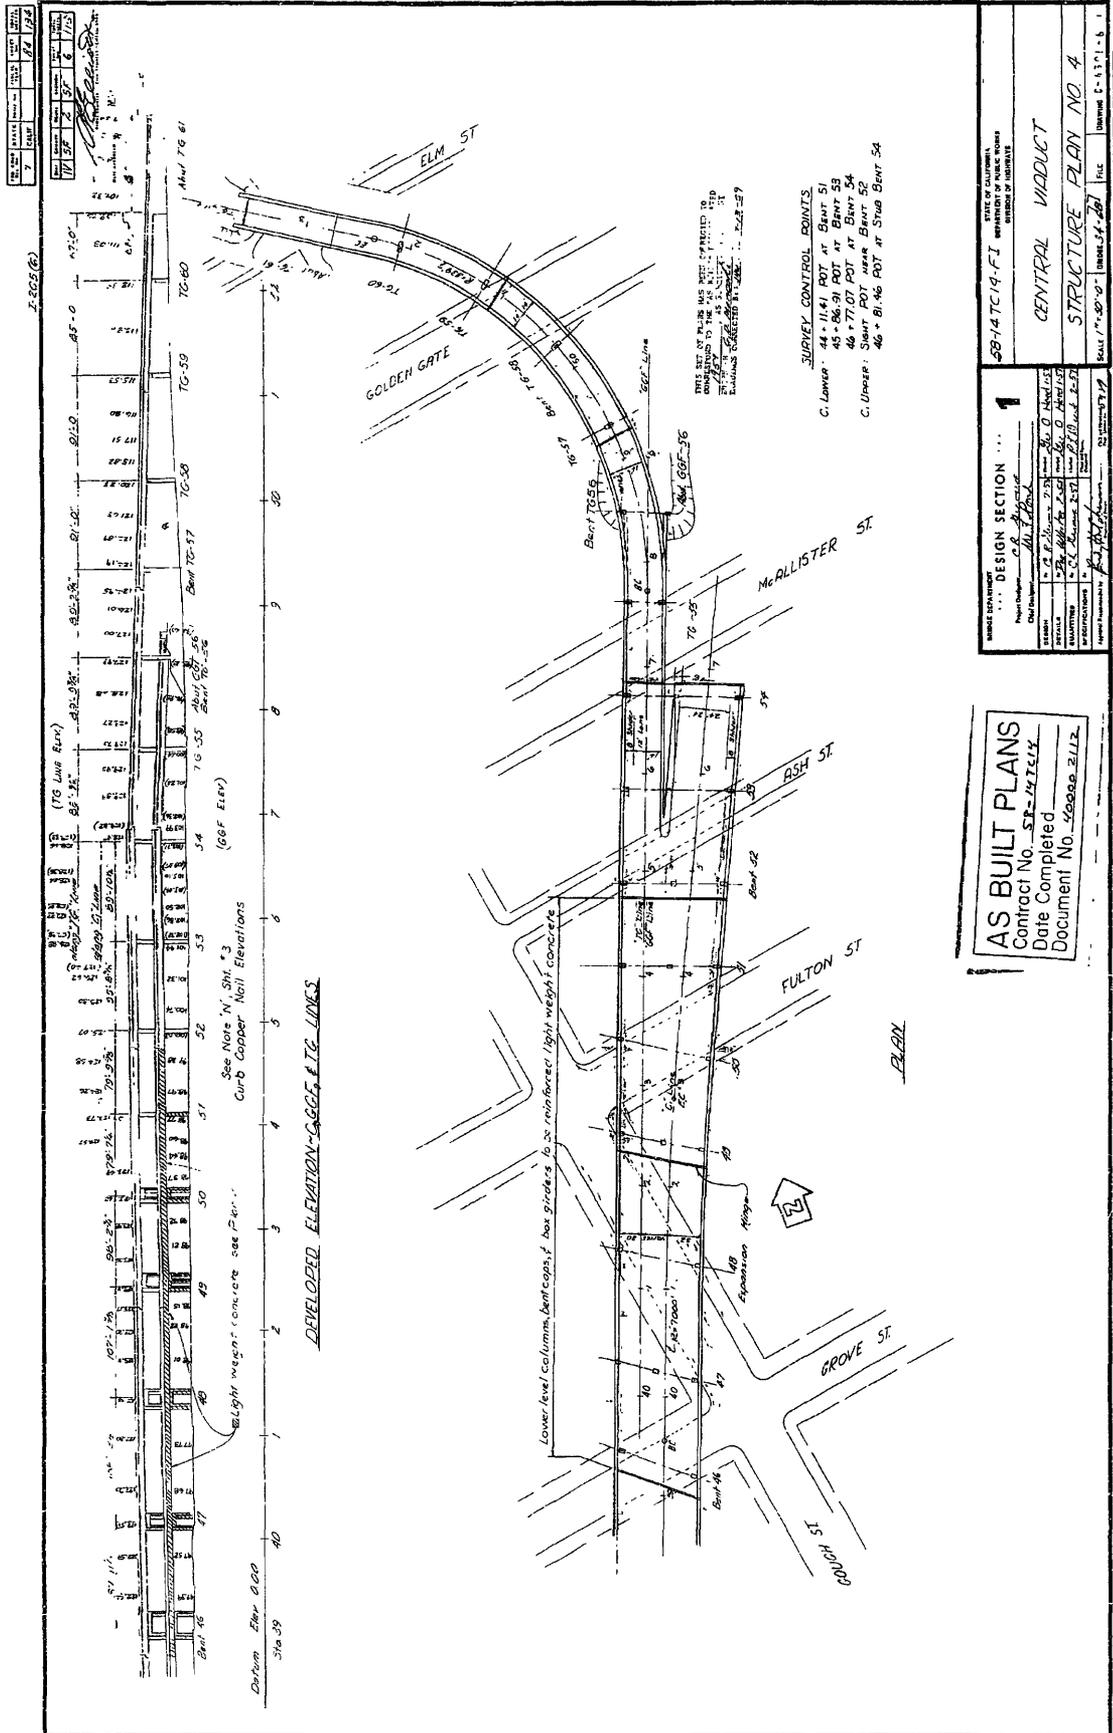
Structural Plan drawing of damaged area at Central Freeway Viaduct.
